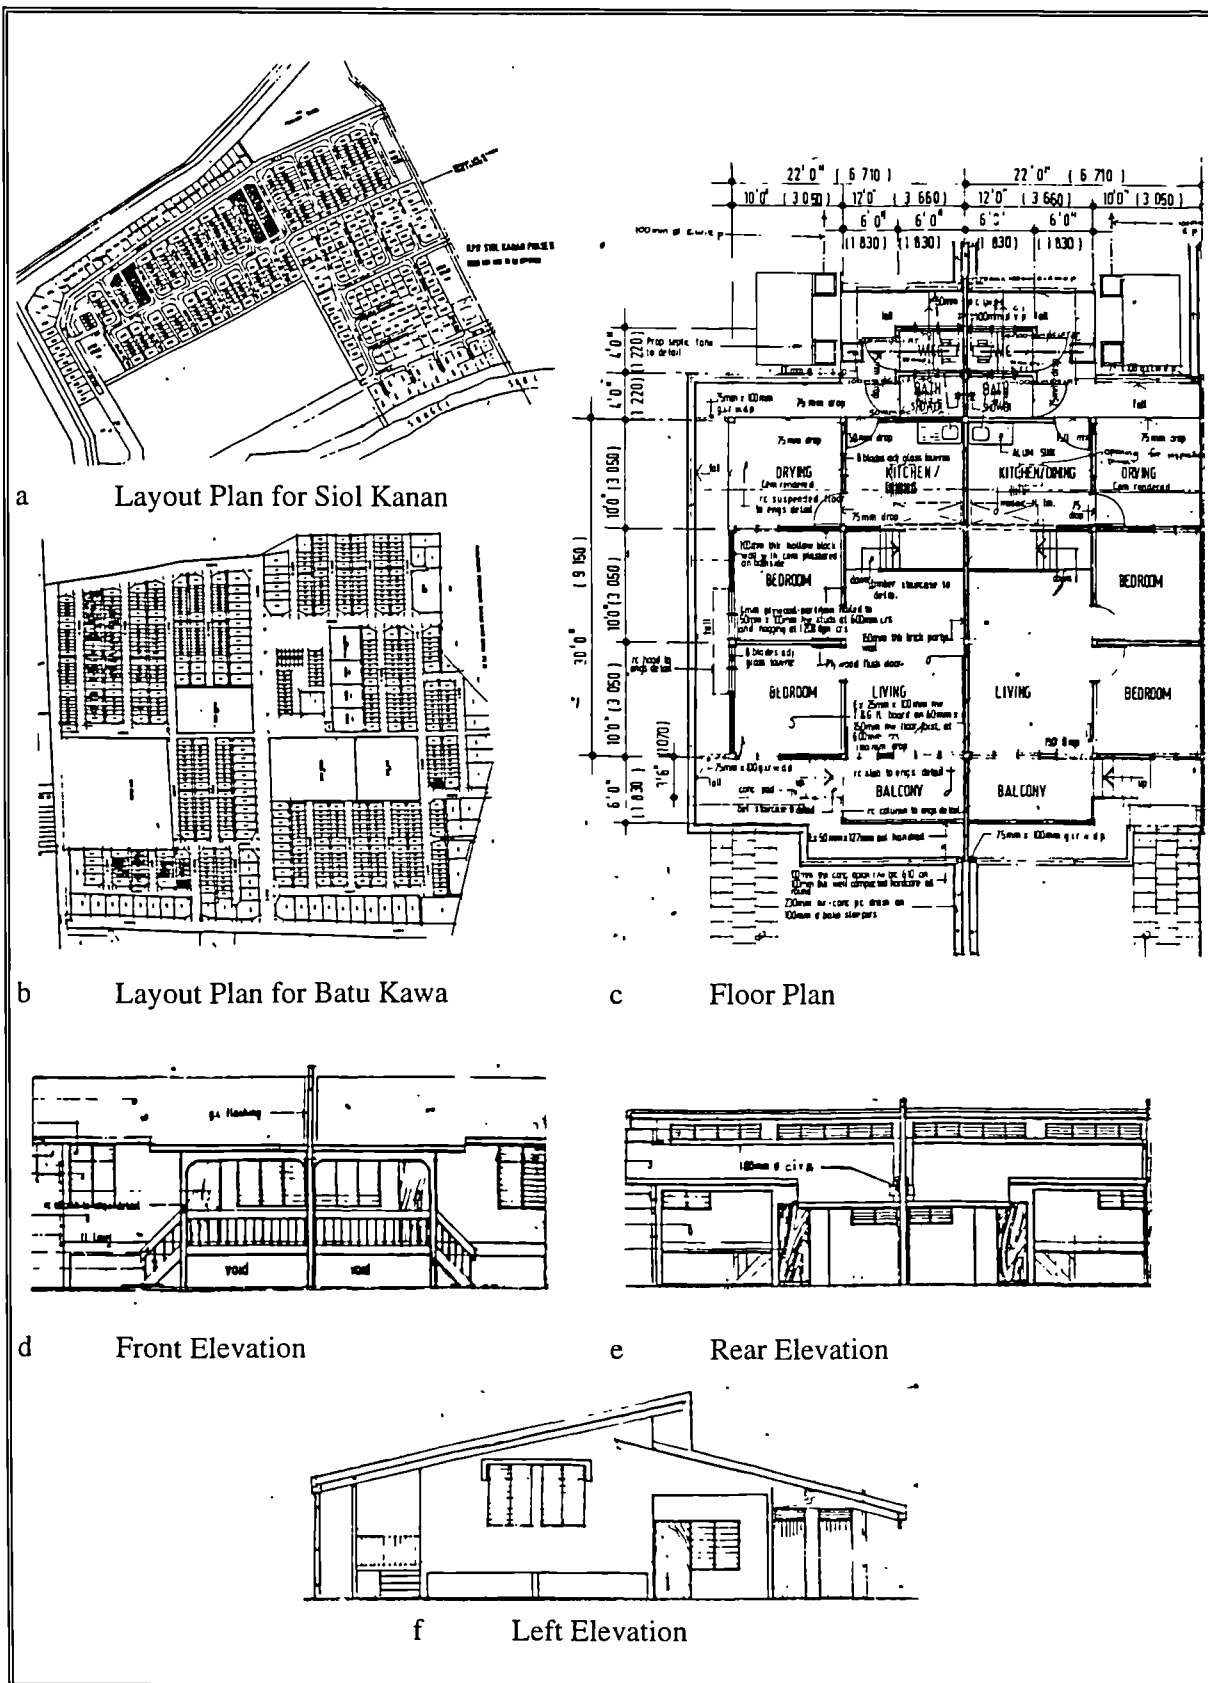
Layout Plans, Elevations and Floor Plans (Siol Kanan and Batu Kawa)
